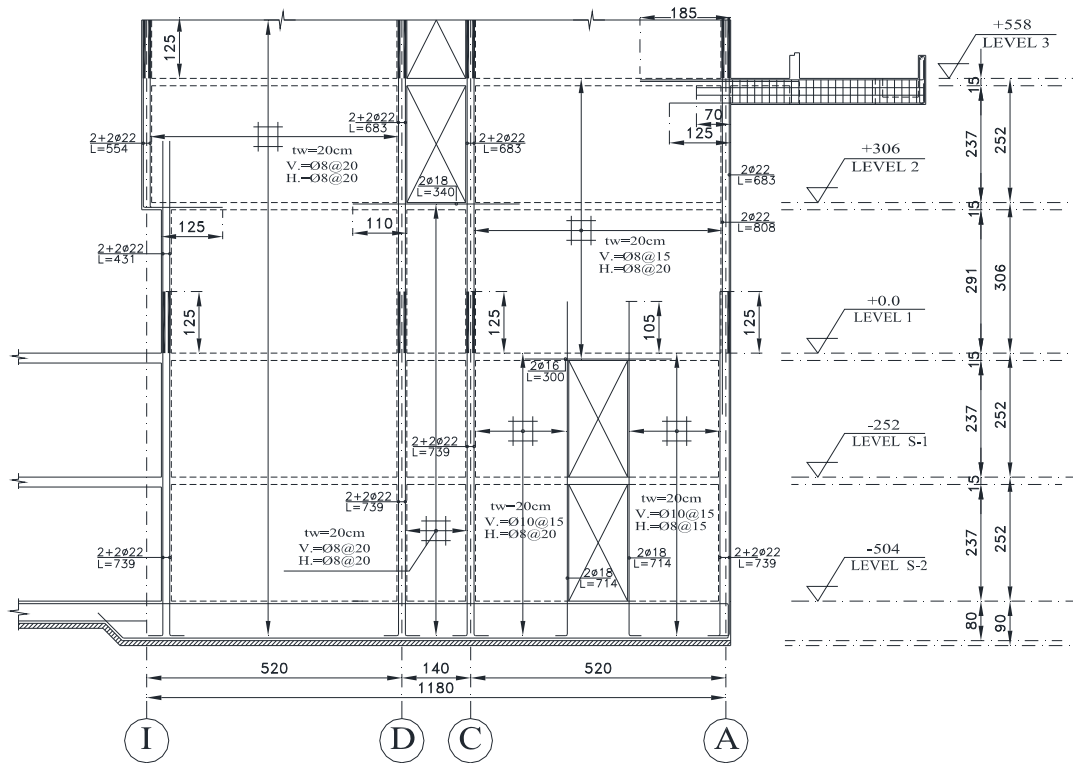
Alto Rio building axis 13 elevation view (Unit: cm) (Note: 1 cm = 0.3937 in)
